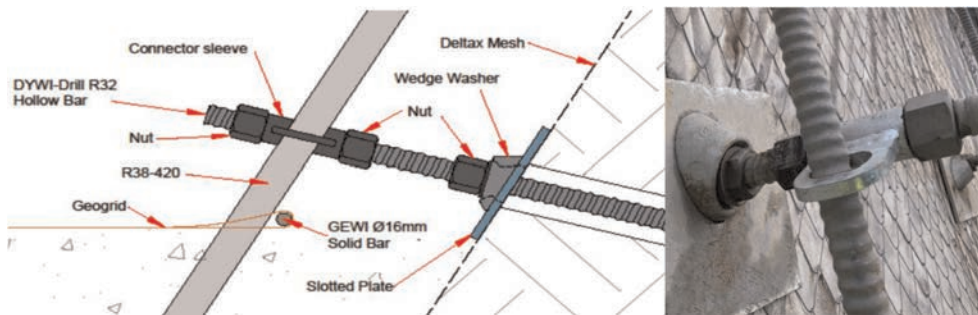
Detail of nail head connection and “towel rail” geogrid connection behind scaffold bar.
